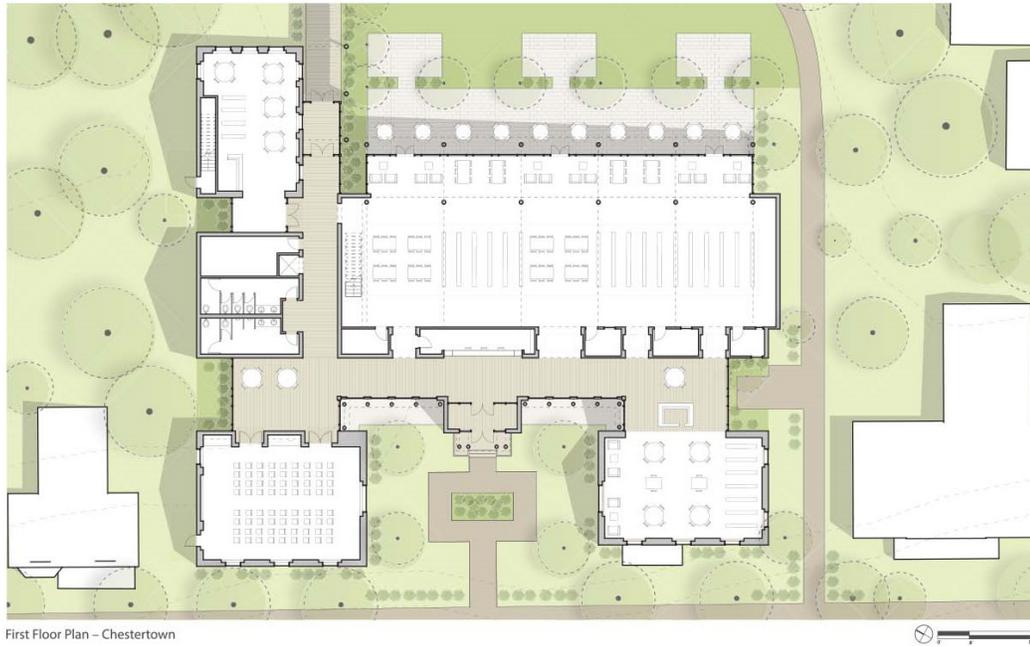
Chestertown, MD – First Floor Plan, Source- Author, 2014
